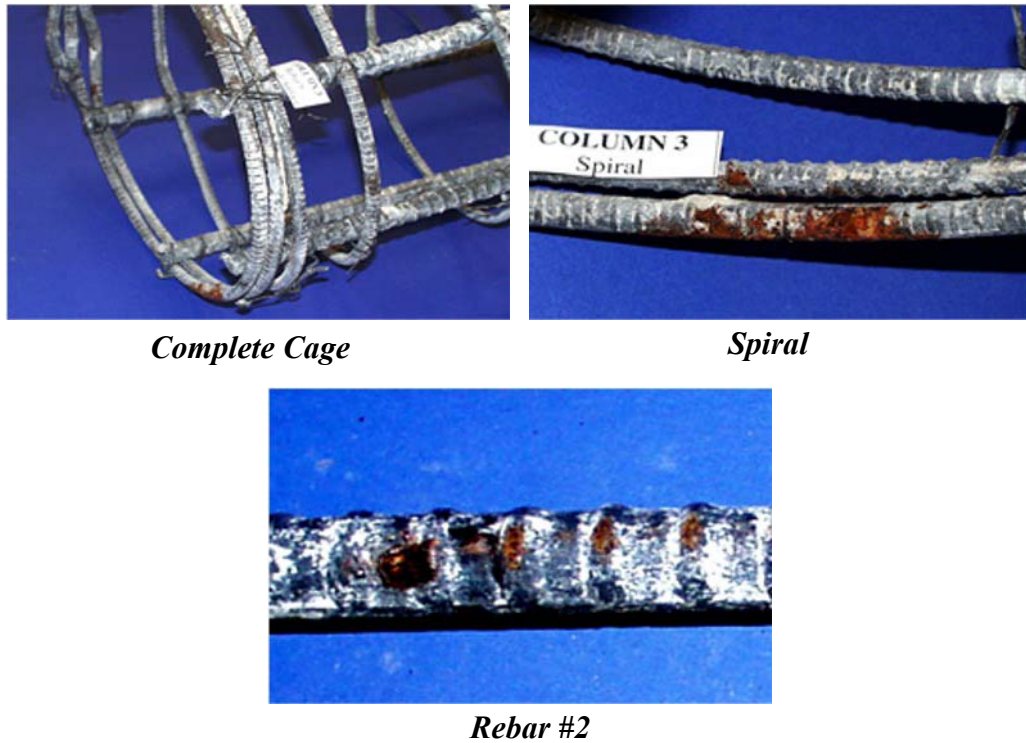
Reinforcement Condition for Specimen NJ-TC-N
